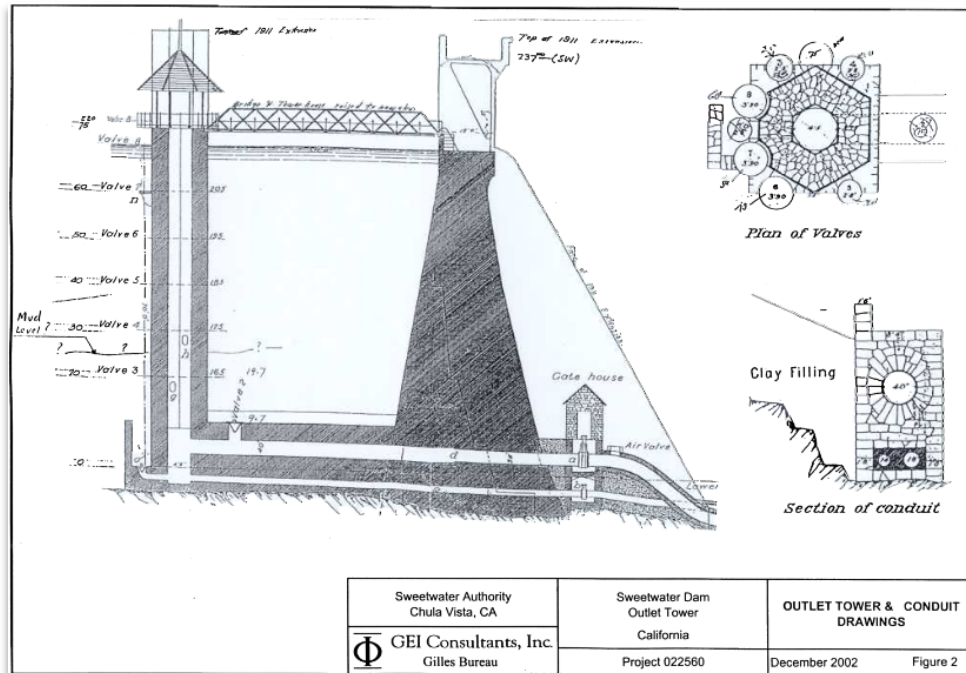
Sweetwater Dam Outlet Tower and Outlet Conduit
